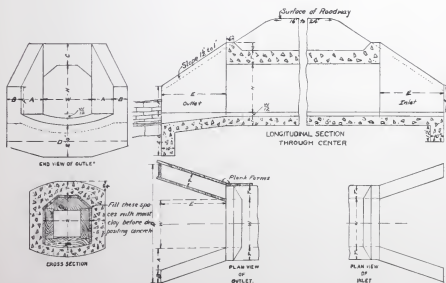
Concrete Culverts designed by the Minnesota State Highway Commission.
